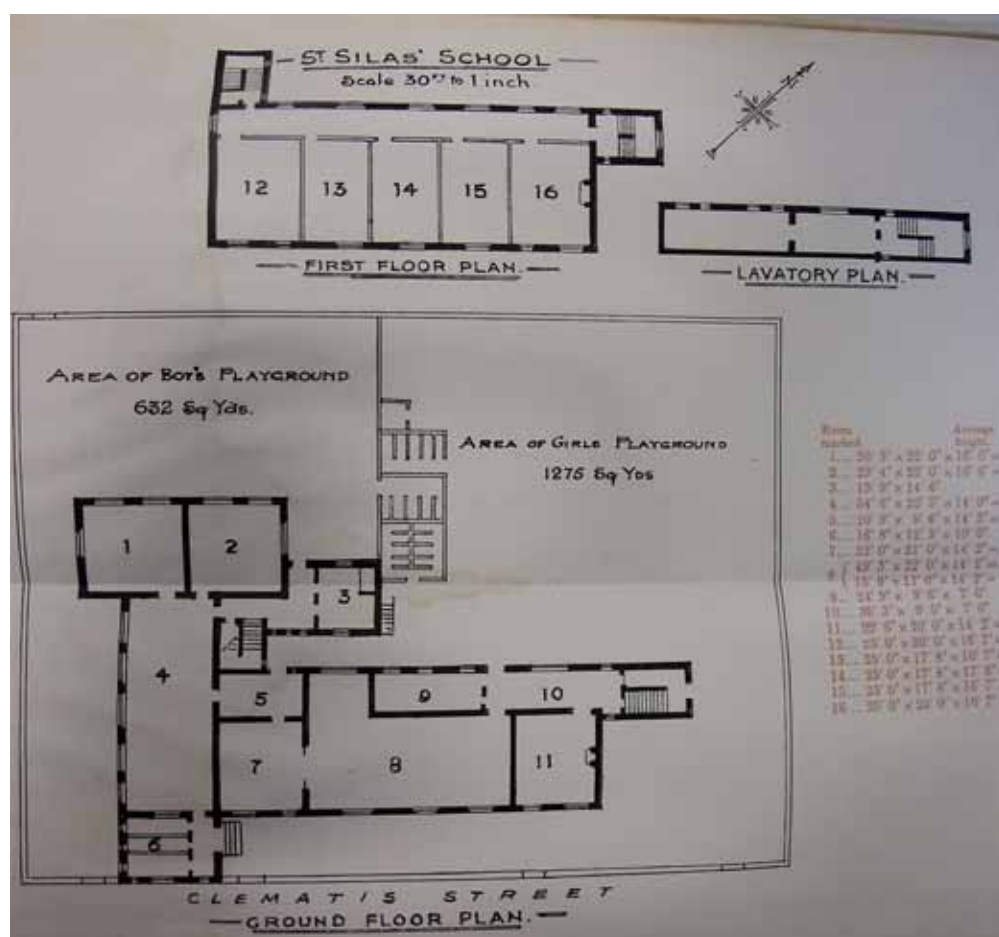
Plan of St Silas' School from a Report on Sanitary Conditions of Blackburn's Elementary Schools, 1904
